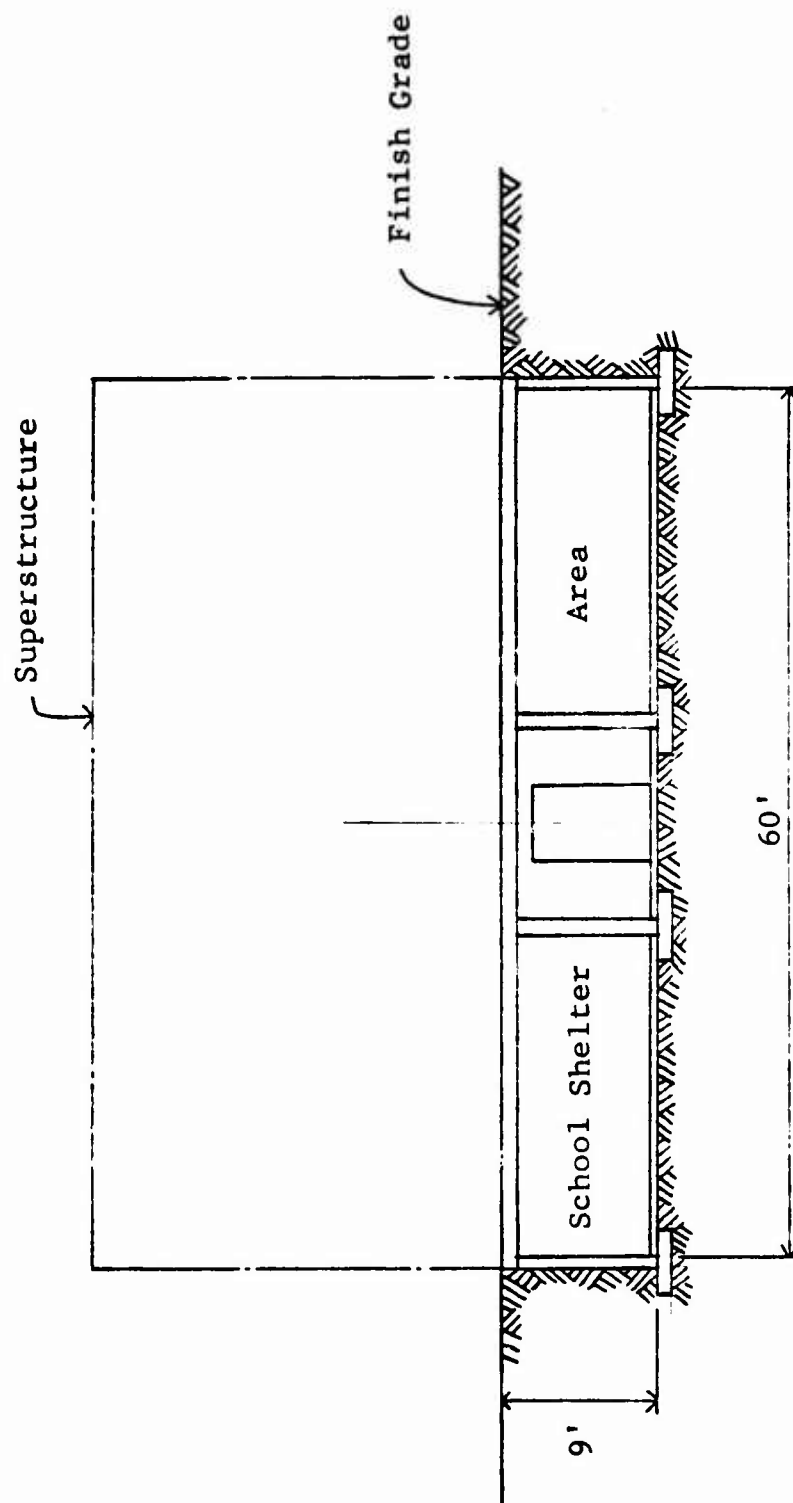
SECTION THROUGH TYPICAL SCHOOL SHELTER
